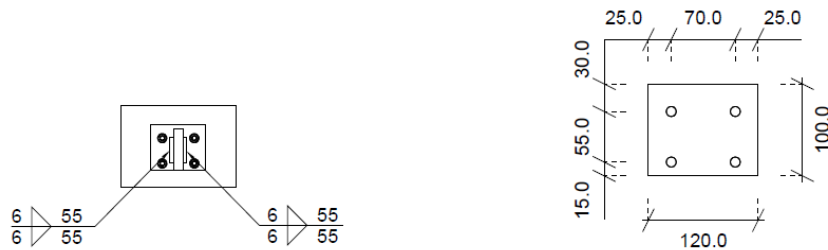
Holes disposition on base plate connected to prestressed beams
